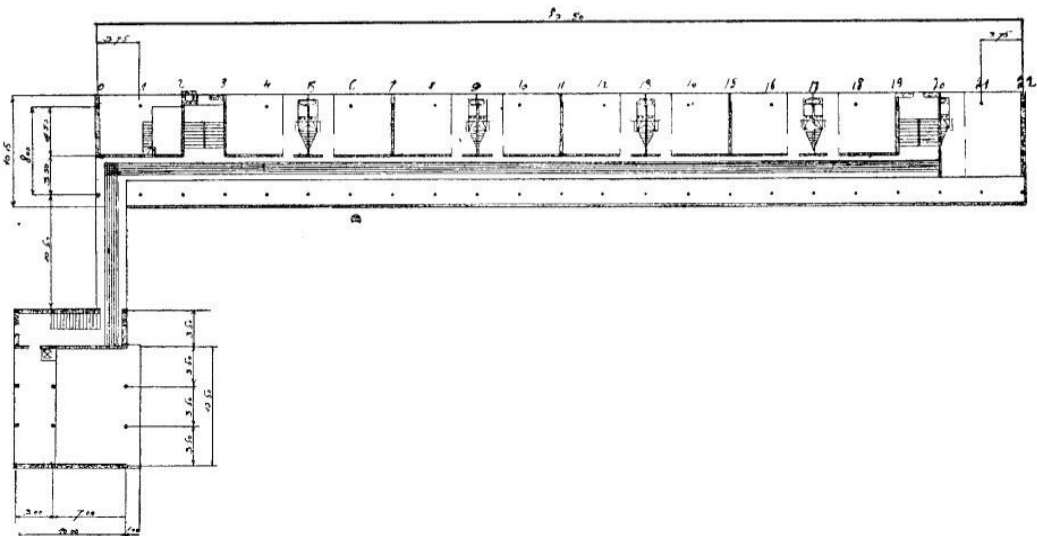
Narkomfin Building, floor plans showing the housing units and their spatial connection with the communal service block.
